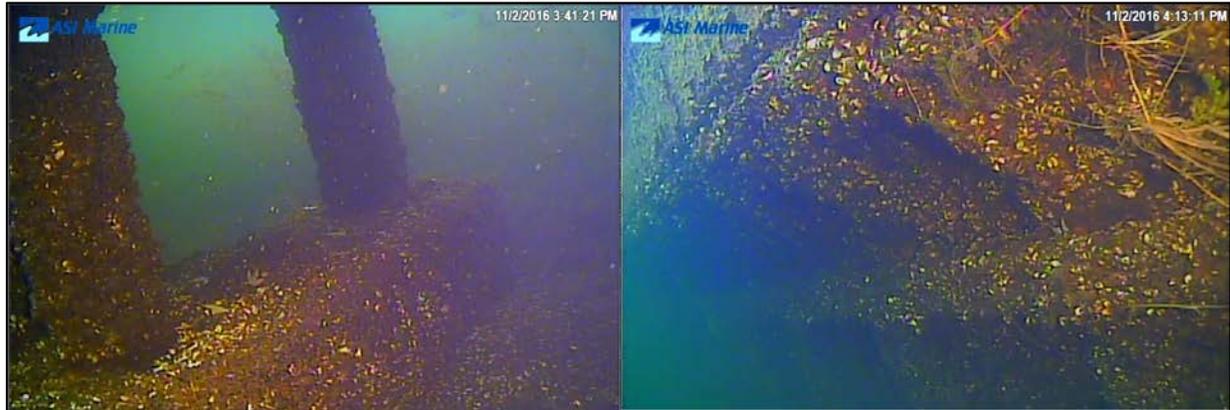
Differing construction from column supported (left) to full cribbing supported (right) structure
